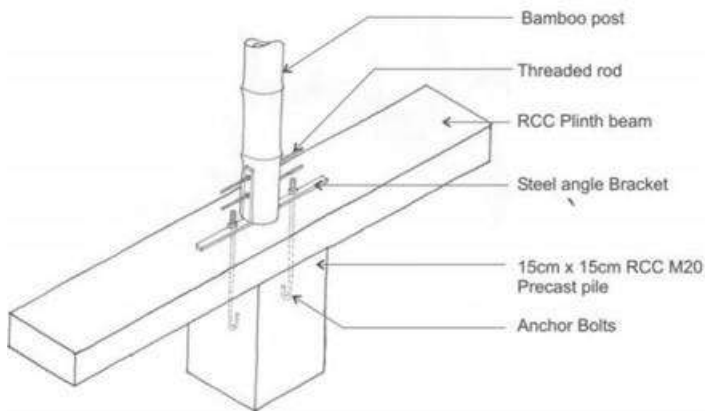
59 Fixing detail of bamboo to plinth using anchor bolts
